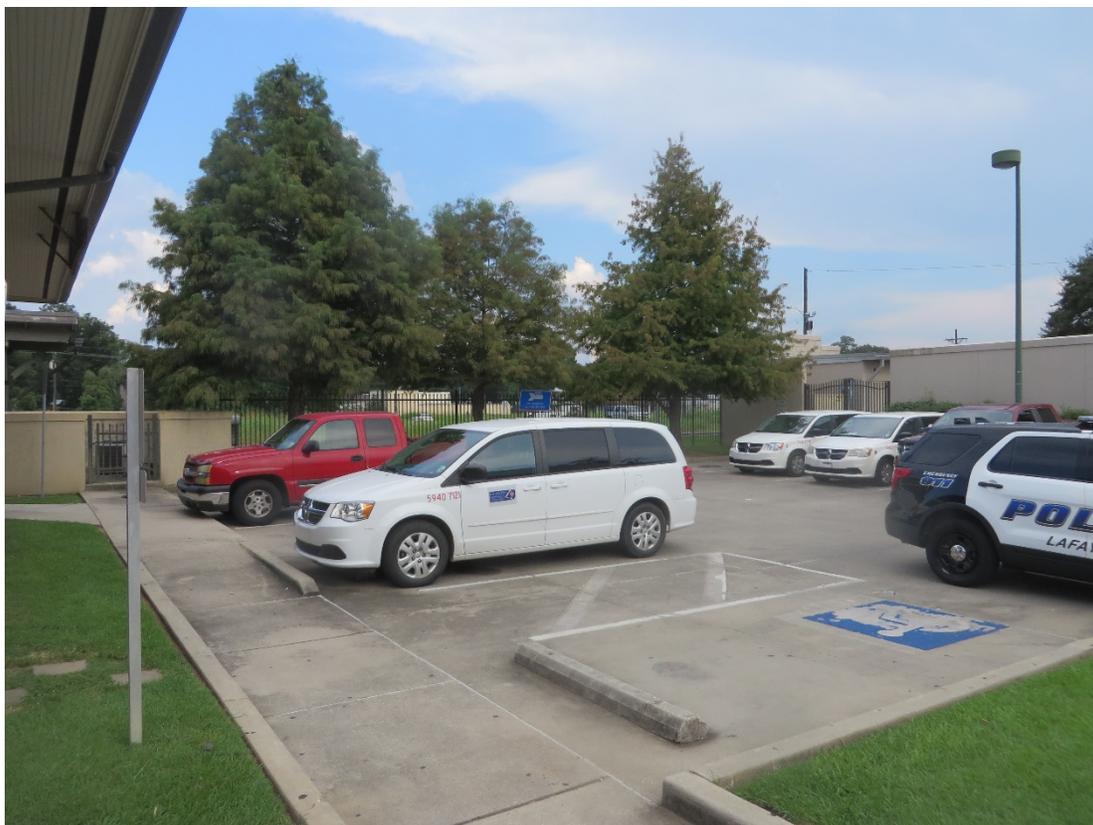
Wheelchair accessible parking space in Employee Parking Only lot south of City of Lafayette Transit office (looking northeast).
